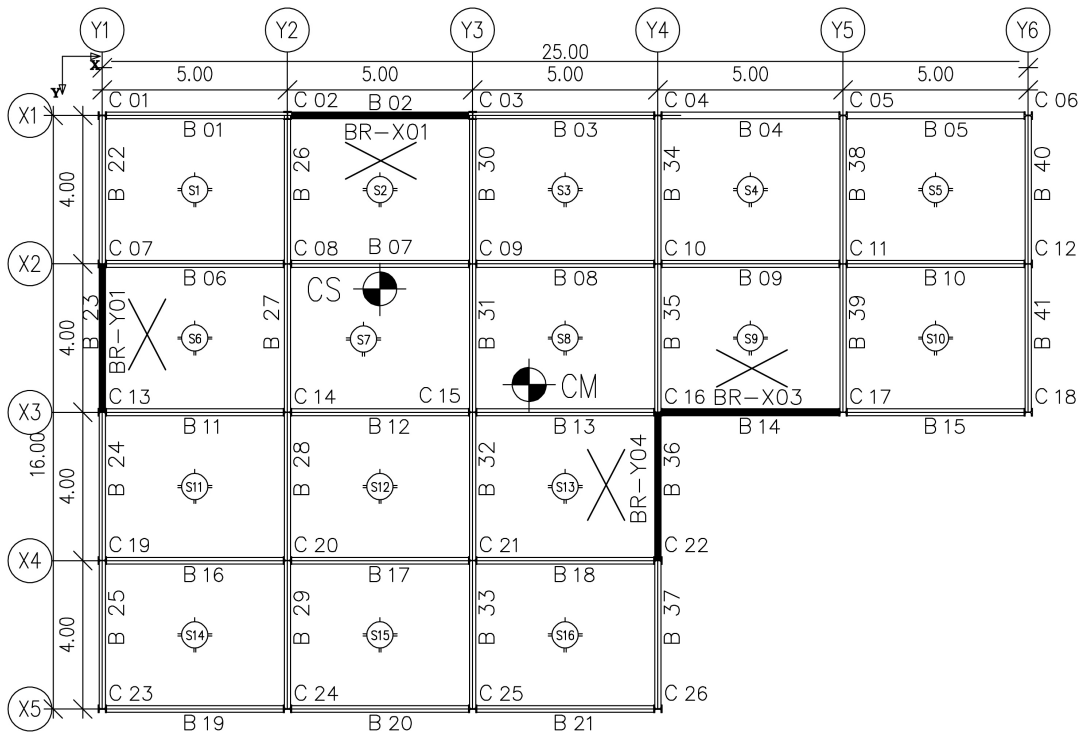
Typical layout of the 5-story torsionally flexible steel building.
